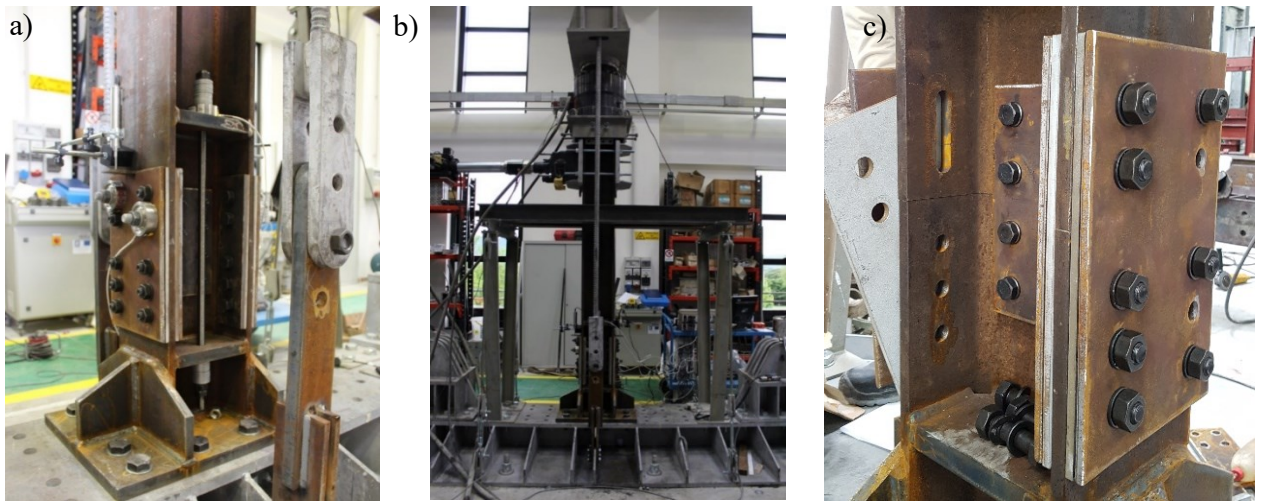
Experimental test of the SC-CB: a) Specimen; b) Testing Set-up; c) Details [1].
